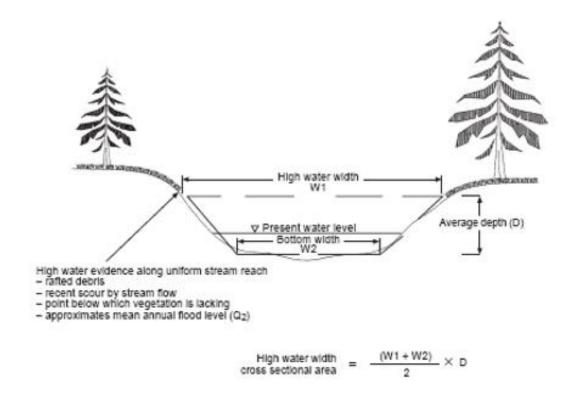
High water width cross-sectional area for culvert diameters (MFLNRO 2002).
